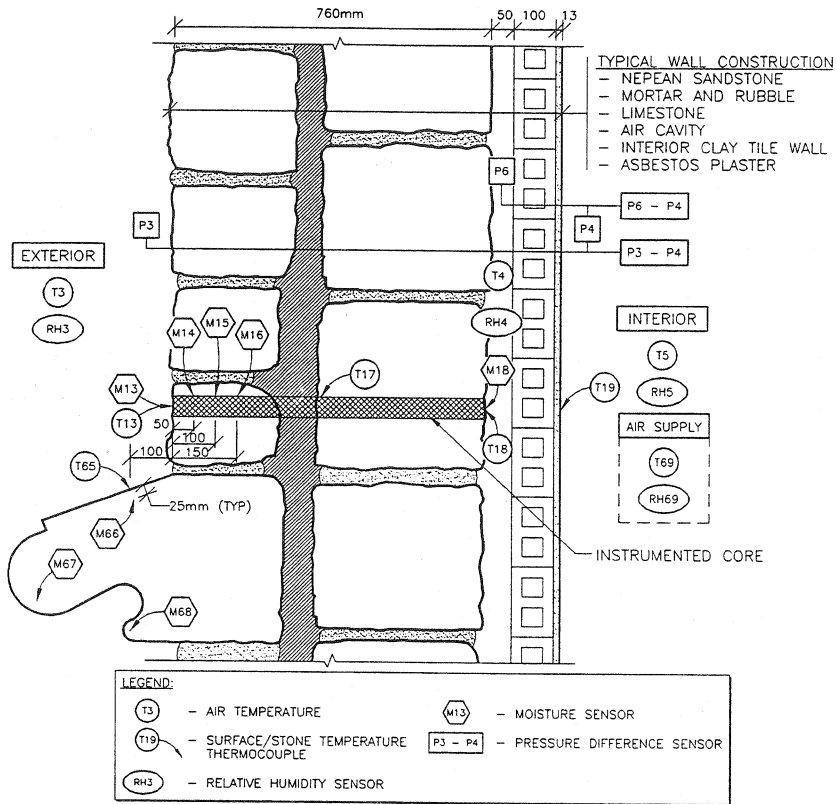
Instrumentation at Fourth Floor Monitoring Station, North Side
